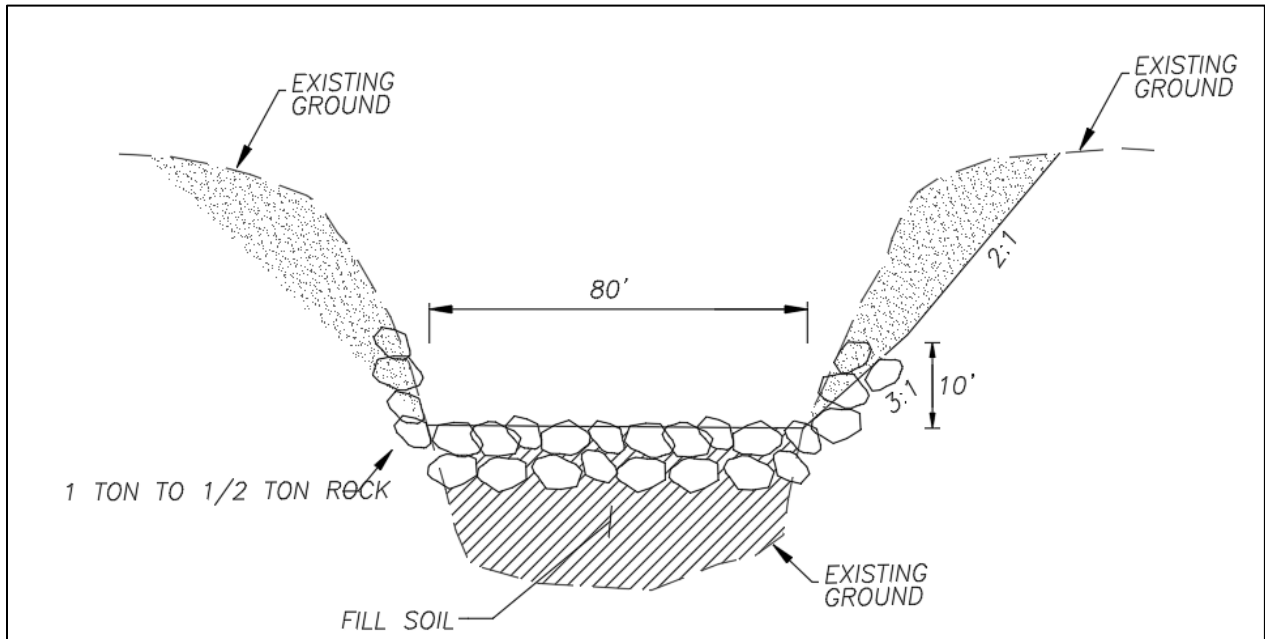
| Typical Rock Stabilization Structure Cross Section, Looking Downstream
